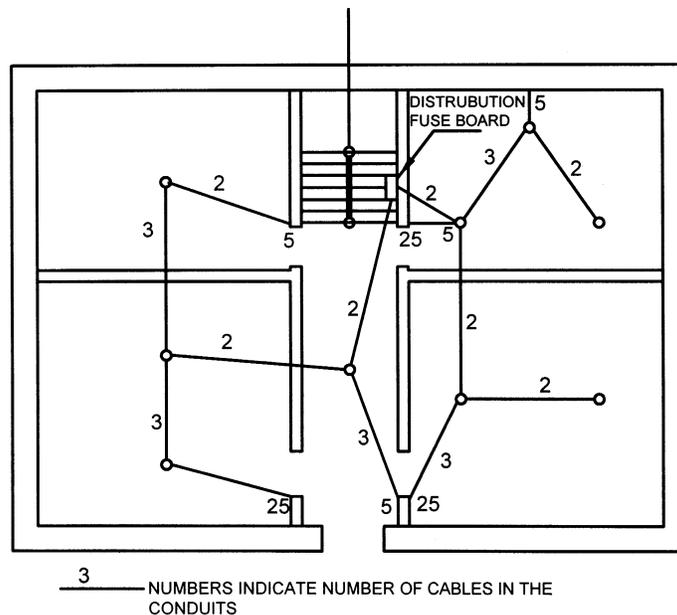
TYPICAL ARRANGEMENT OF CONCEALED CONDUITS FEEDING LIGHTING POINTS BY LOOPING THE CONDUIT INTO THE BACK OF OUTLET BOXES
